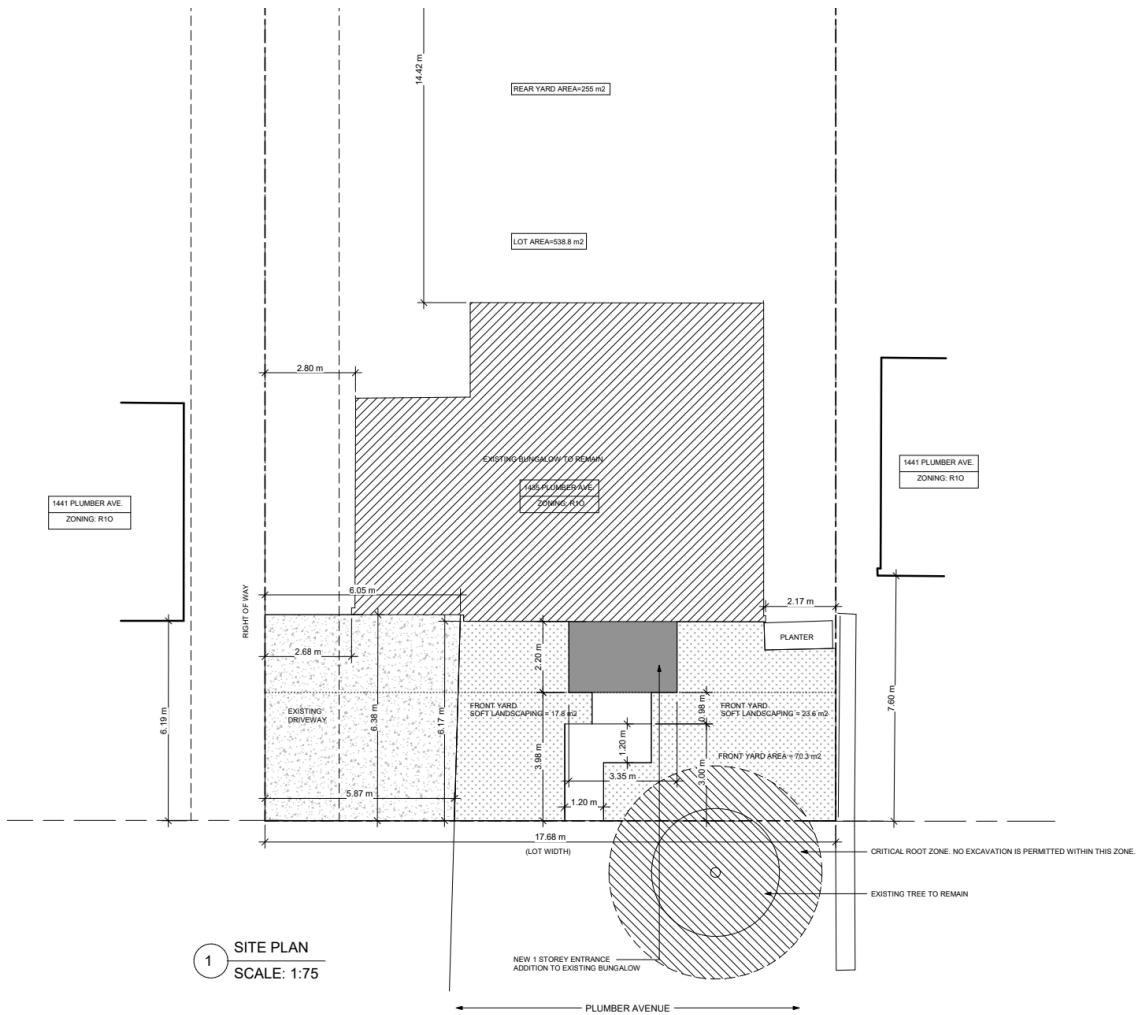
Extract Site Plan, Prepared by Redline Architecture
